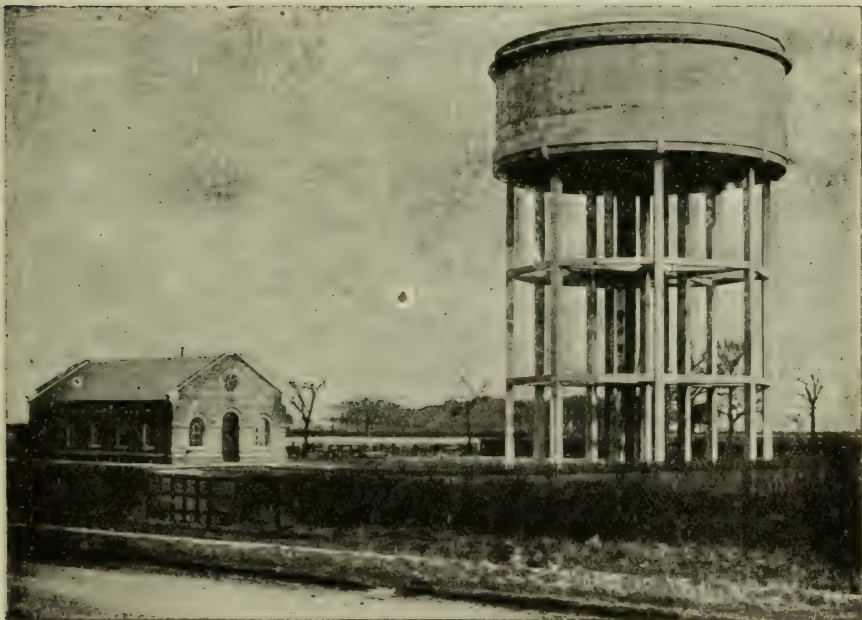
Pumping Station and Water Tower at Hatfield, near Doncaster.
